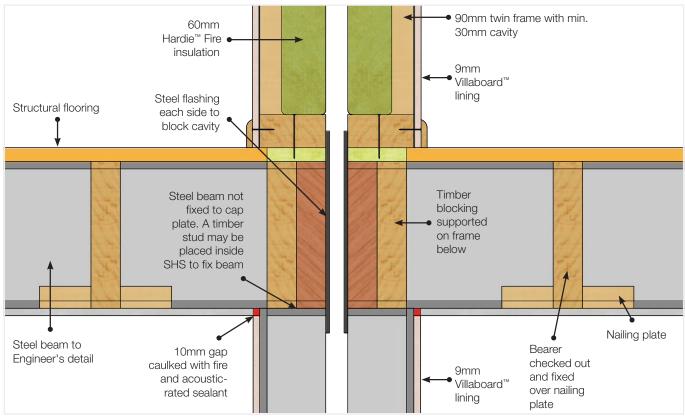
STEEL BEAM AND COLUMN PERPENDICULAR TO FIRE WALL - SECTION VIEW
